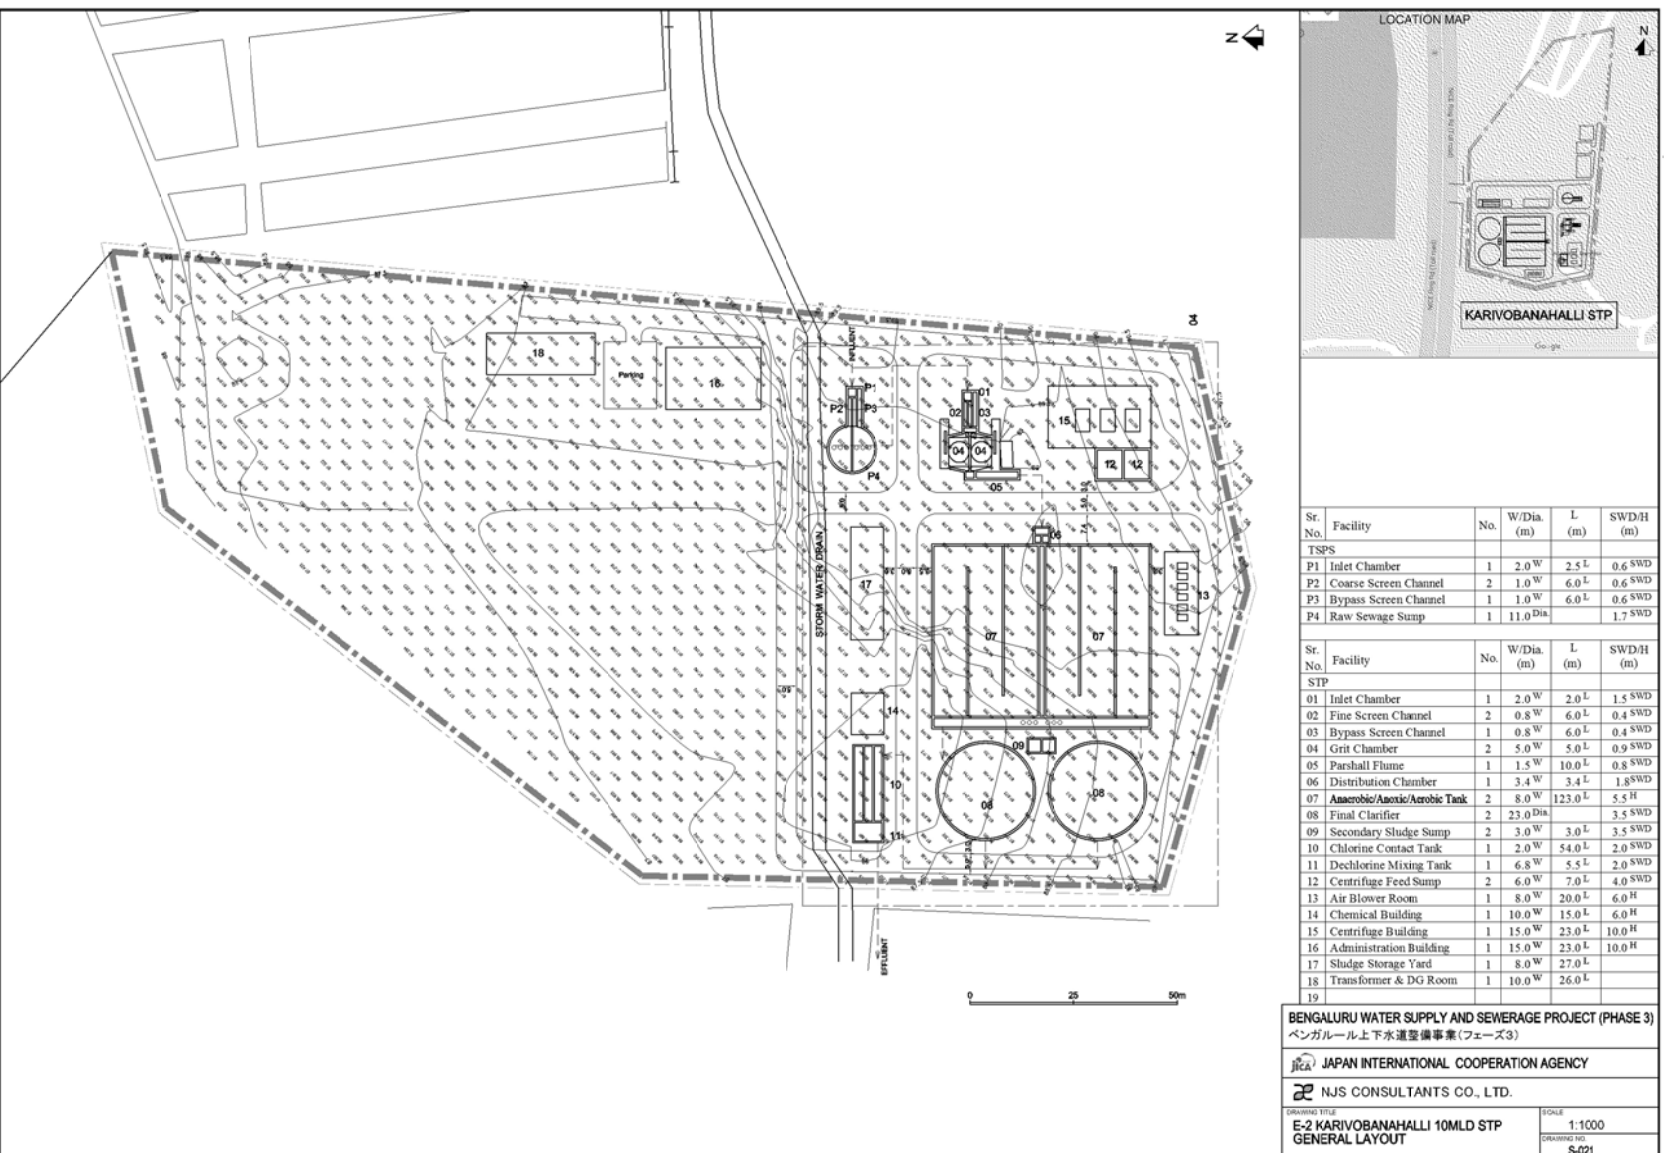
Layout plan of Kairivobanahalli STP
